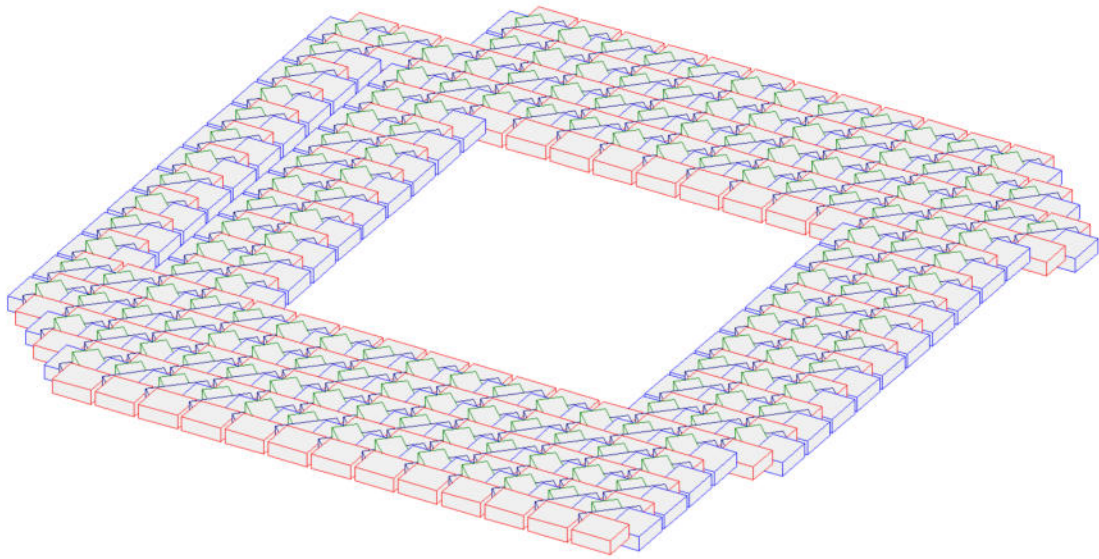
Analysis Model 3D Rendering - L07 (UB) Reinforced Concrete Floor
